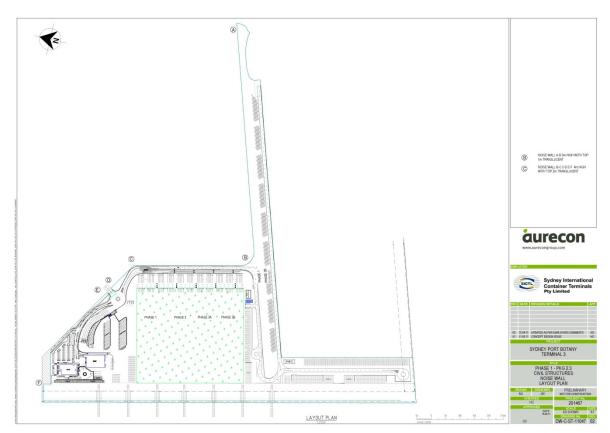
Showing the general approved site layout and proposed modified buildings arrangement.
